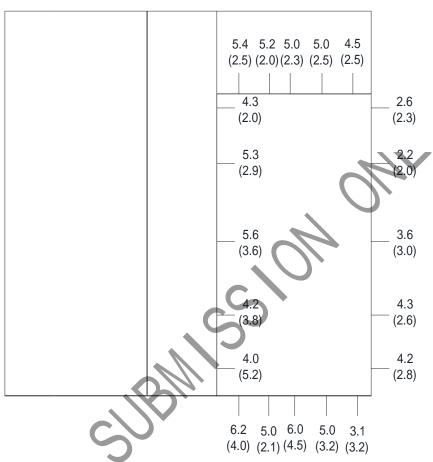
Gaps measured between Door Leaf of Single-leaf Door and Door Frame as Viewed from the Unexposed Surface
